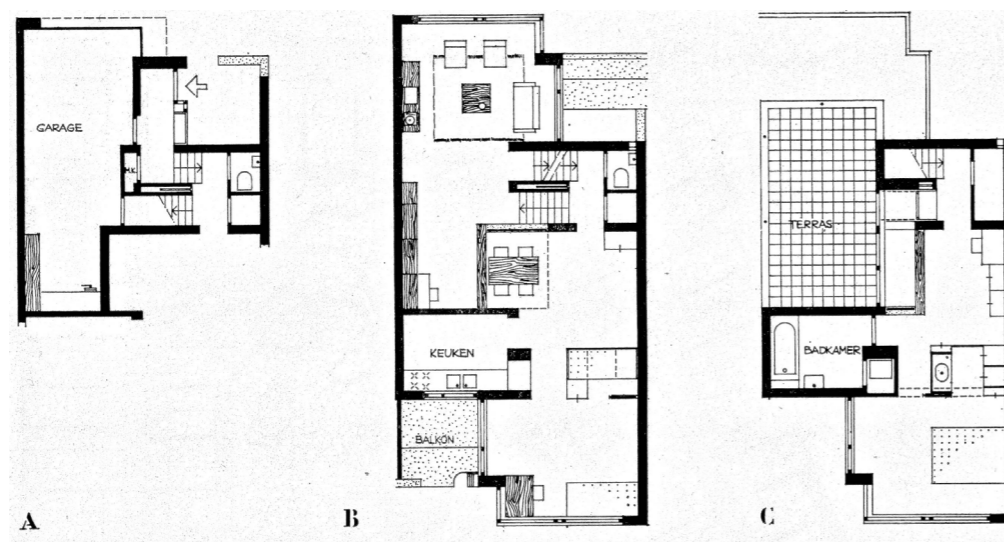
Diagoon Houses* typical floor plans (Herman Hertzberger, 1970)
